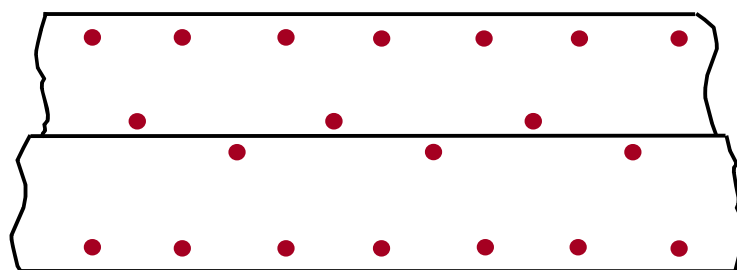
Pattern of grout pumping holes used to correct a settlement.
